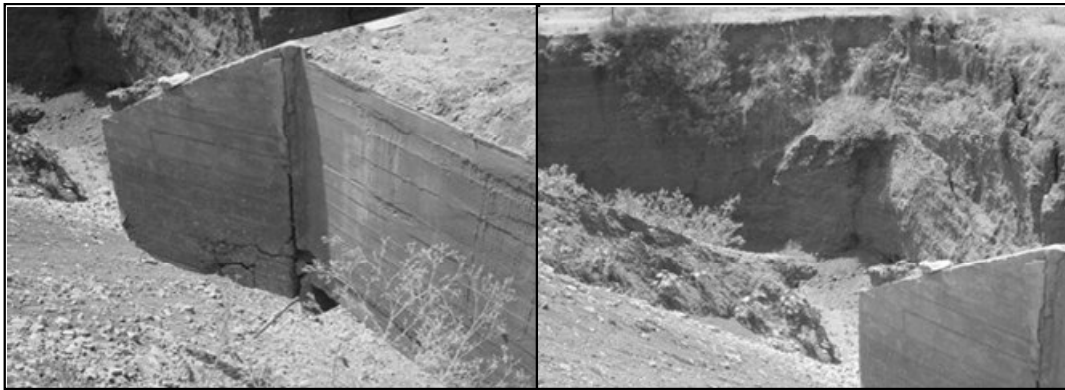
Gully formation which leads to scouring and subsequent failure of a box culvert that was founded on expansive soil on the Awash – Hirna feeder road section (EMSB, 2000).
